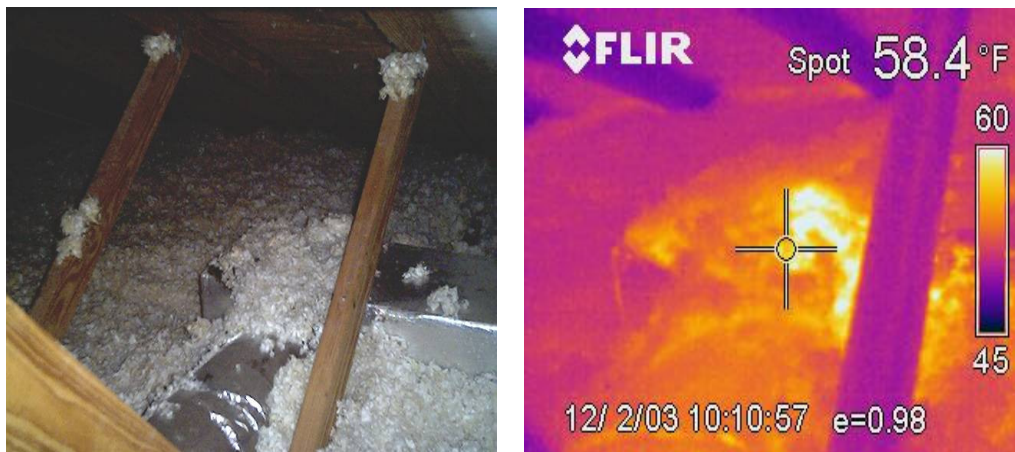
Cold spot on hall ceiling caused by supply junction leak in attic over ceiling board
